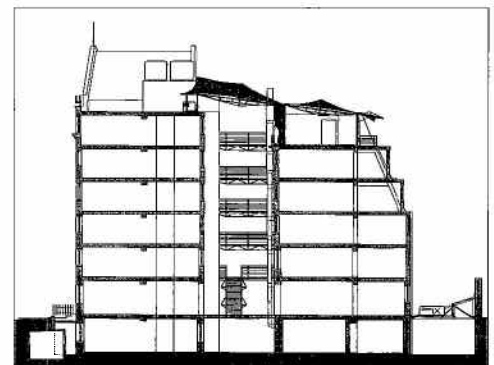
Section through development showing atrium between parallel multi-storey buildings
